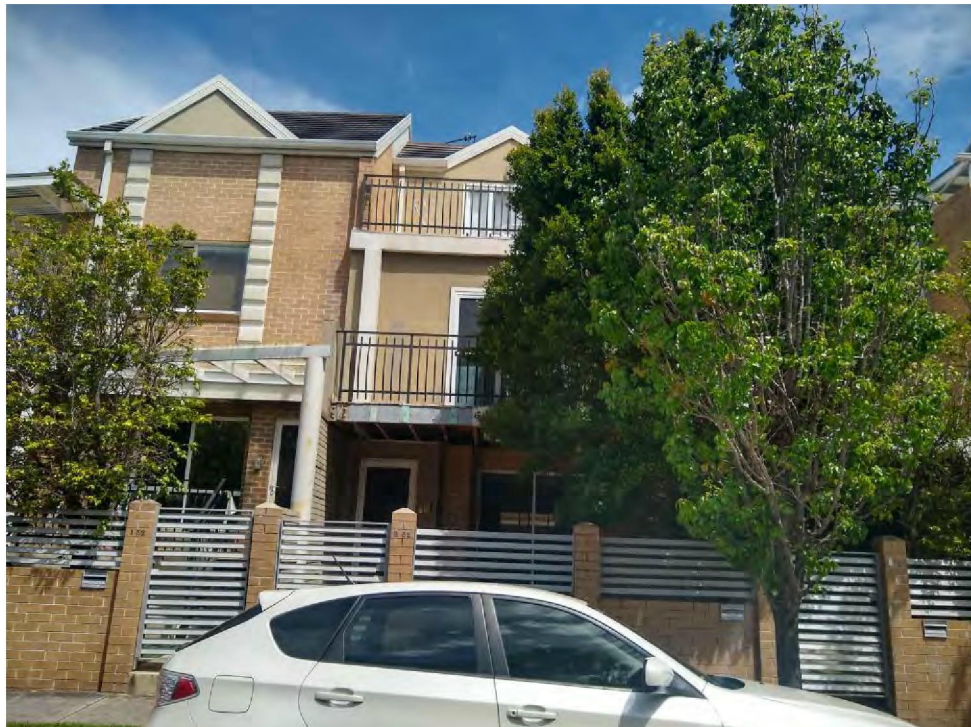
Northern site boundary, 52 Anderson Street (SP78790) along O'Brien Street
